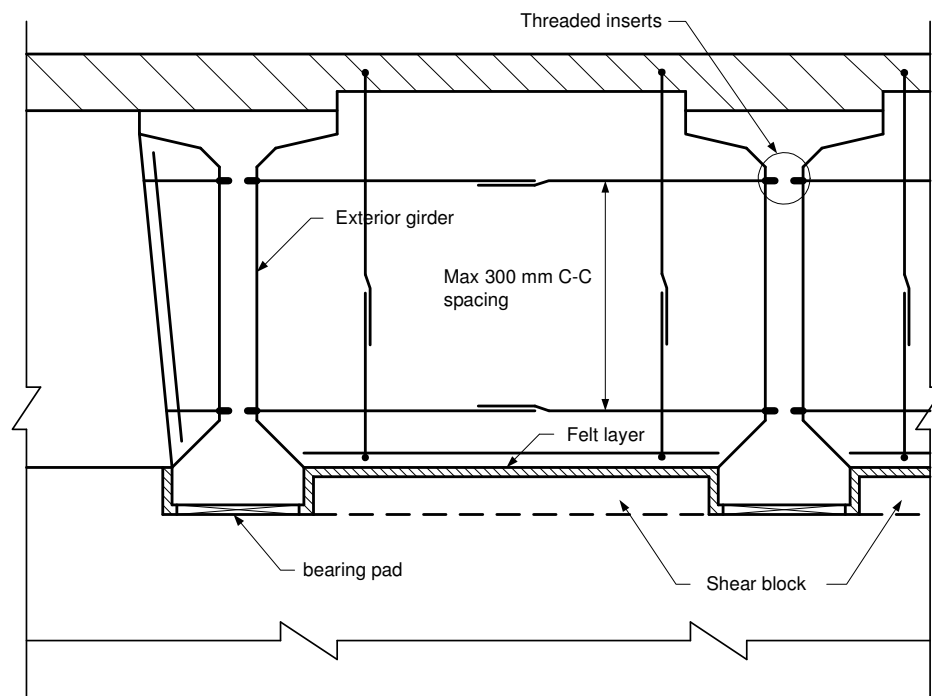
Typical Diaphragm at Intermediate Pier (Expansion Bearing)
